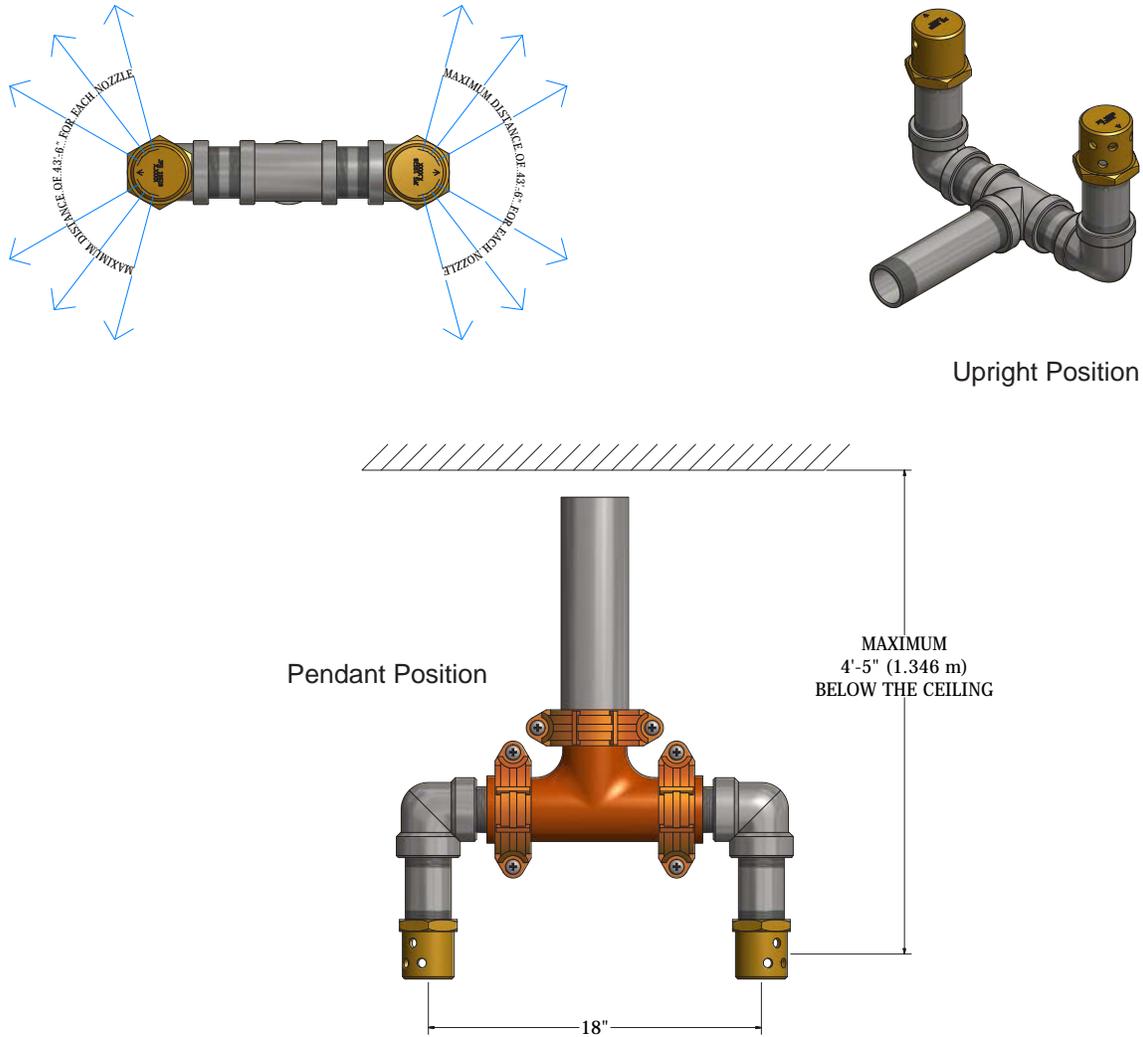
Back-to-Back Sidewall Nozzle Orientation - Typical Arrangements
